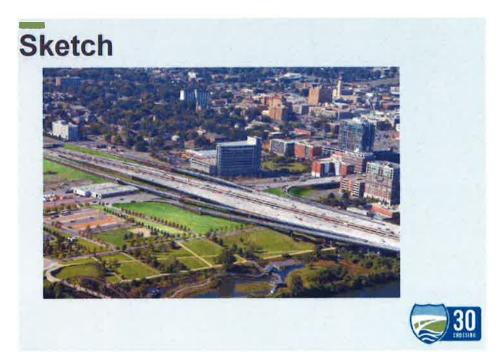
Artist's rendering of new bridge corridor Note 1. The amount of width added to the bridge as a barrier to east-west connectivity. Note 2. The number of connections east-west is reduced in half.
